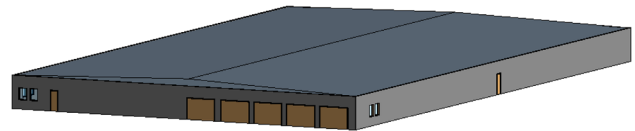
3-D model of the low rise commercial building developed using Design Builder software
